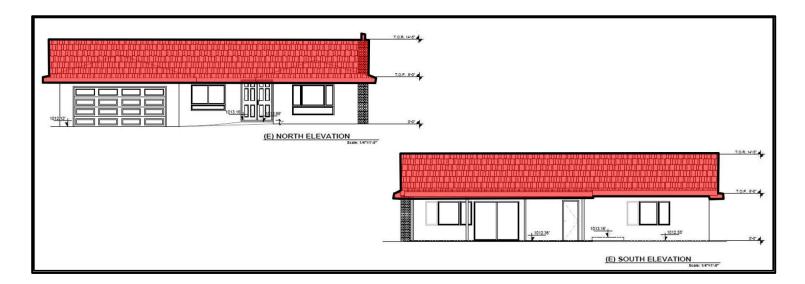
Existing elevation of proposed development with areas of demolition shown in red
